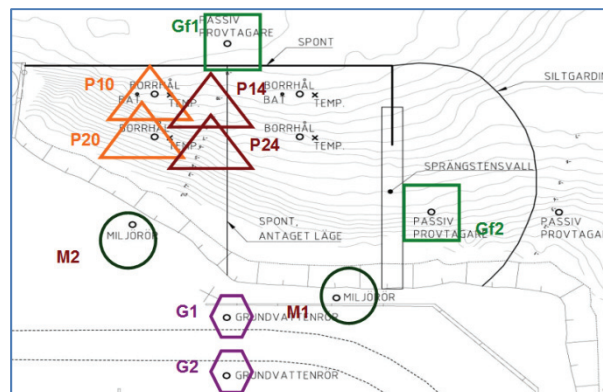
Principle sketch of sampling spots/areas within and outside the construction.
